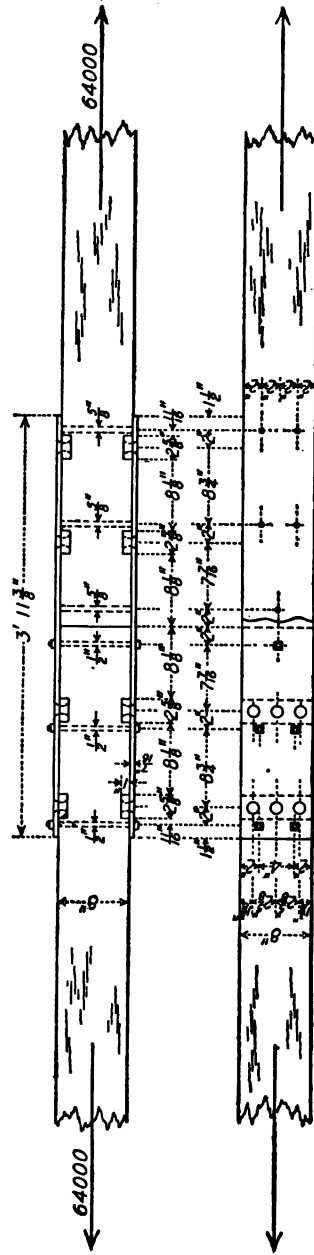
Working Drawing of Joint with Steel Tabled Fish Plates.
